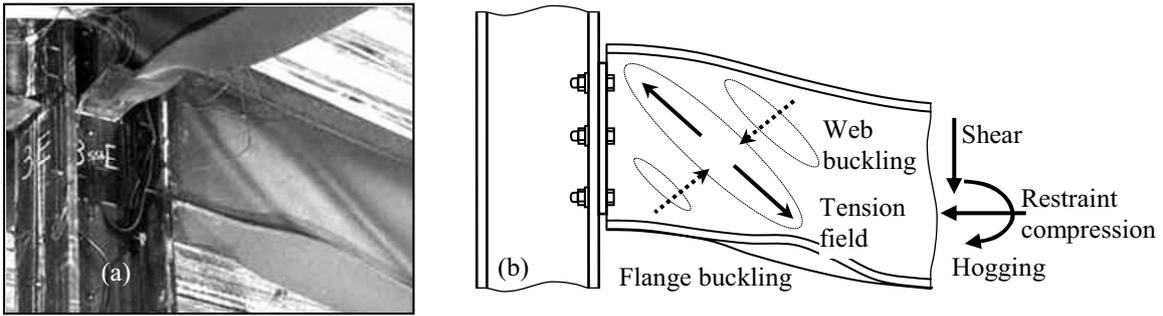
Local buckling; (a) Cardington fire test detail, (b) Forces causing local buckling.
